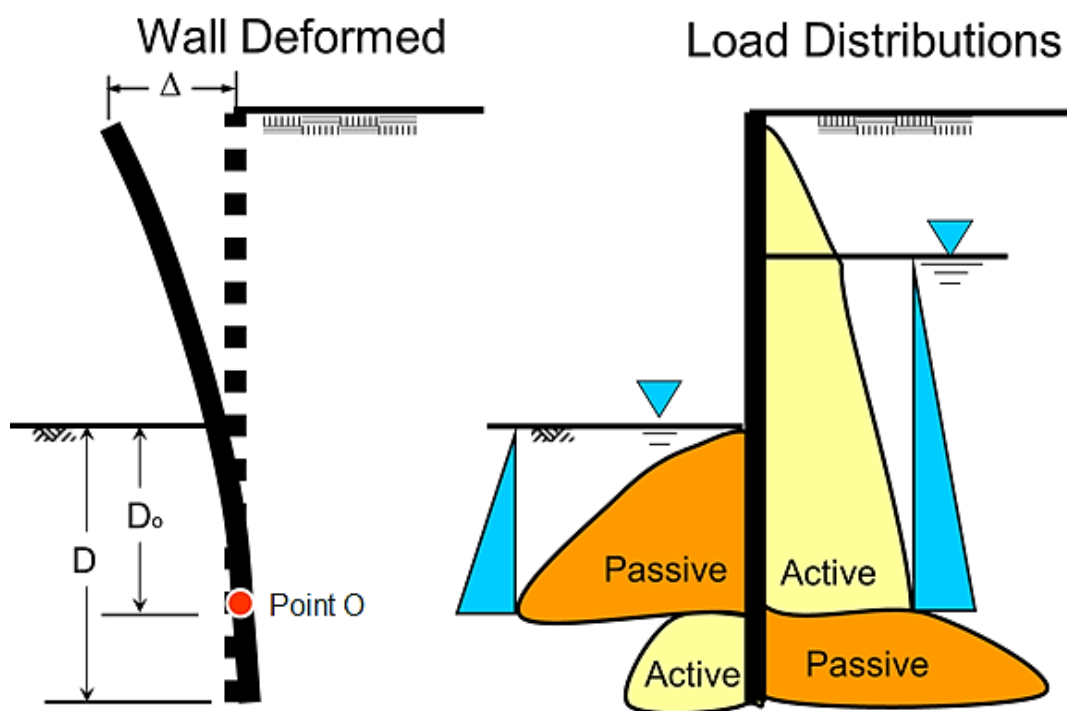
Non-Gravity Cantilever Retaining Walls Loading Diagram
